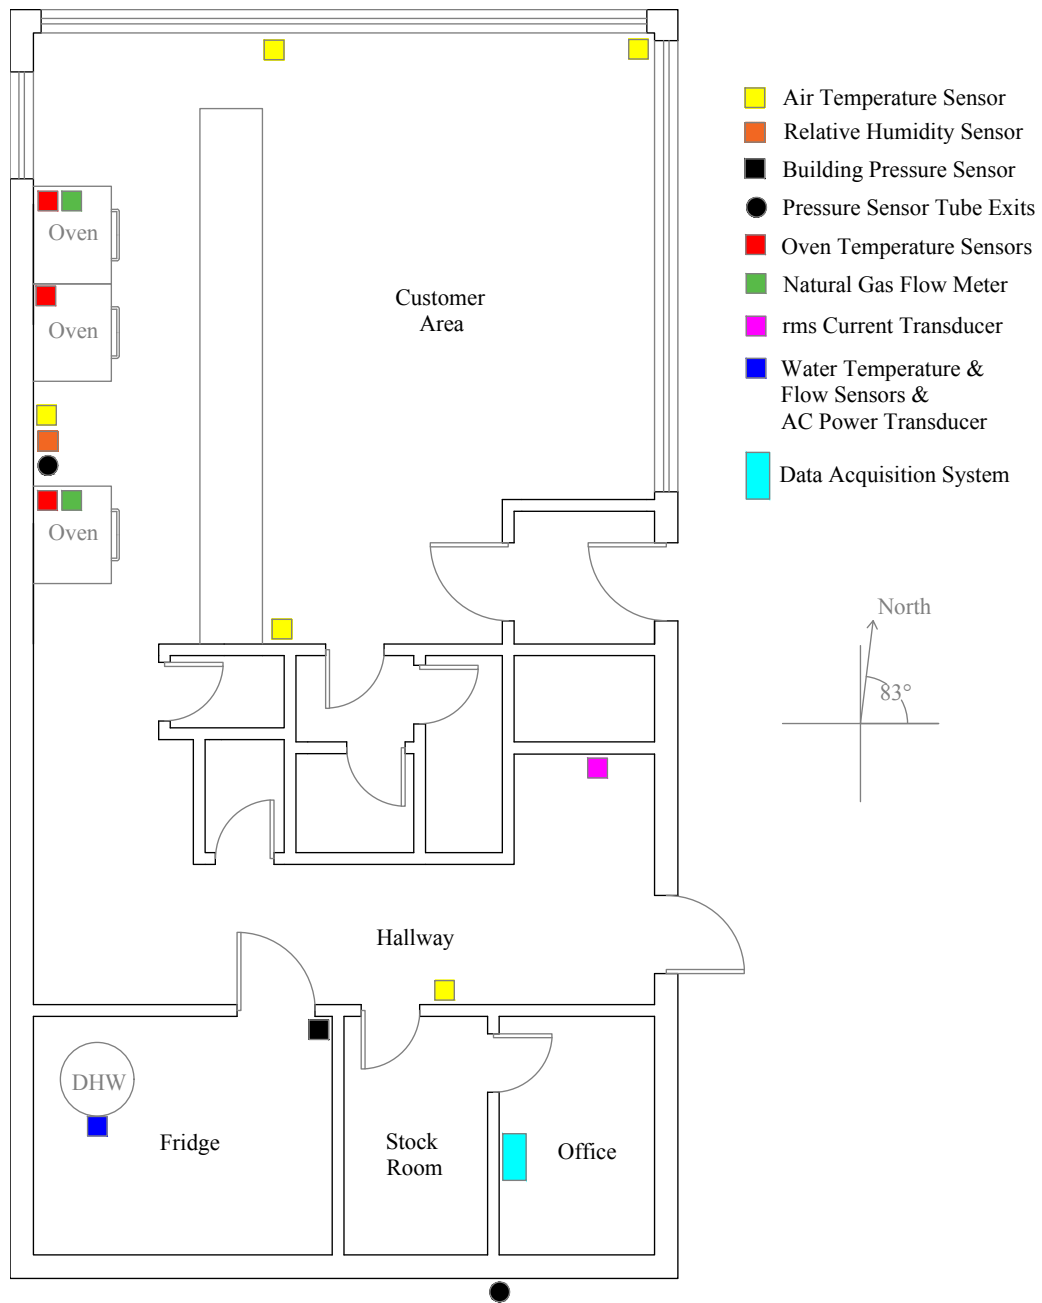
Building Floor Plan and Instrumentation Schematic – Store A
